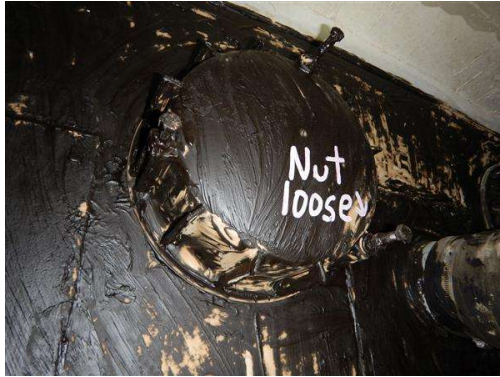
Loose bolt on PT anchor head at Pier 12SB looking North
